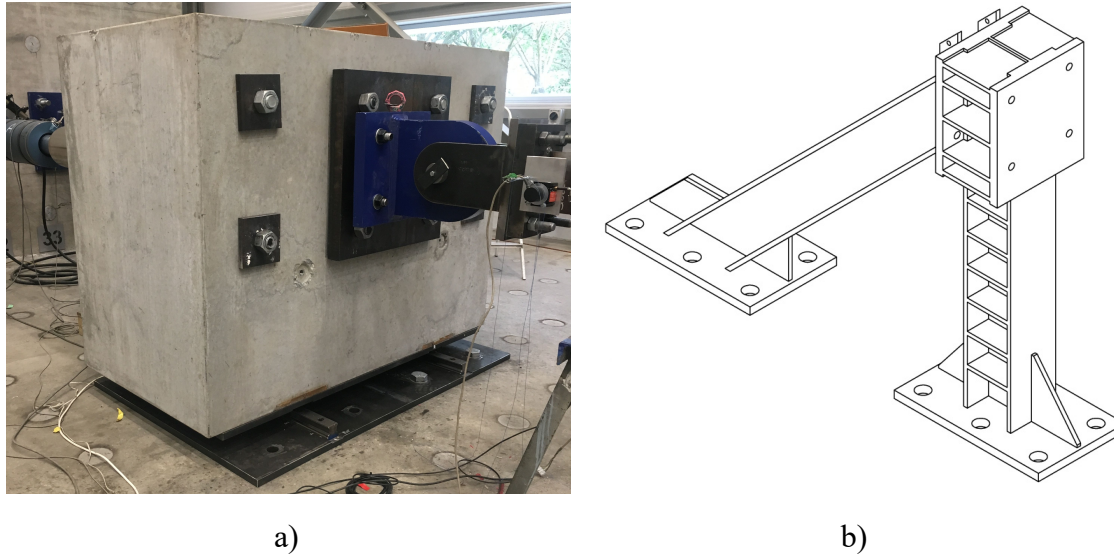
Eccentric unstiffened specimen configuration a) Actuator connection b) Free-standing frame
